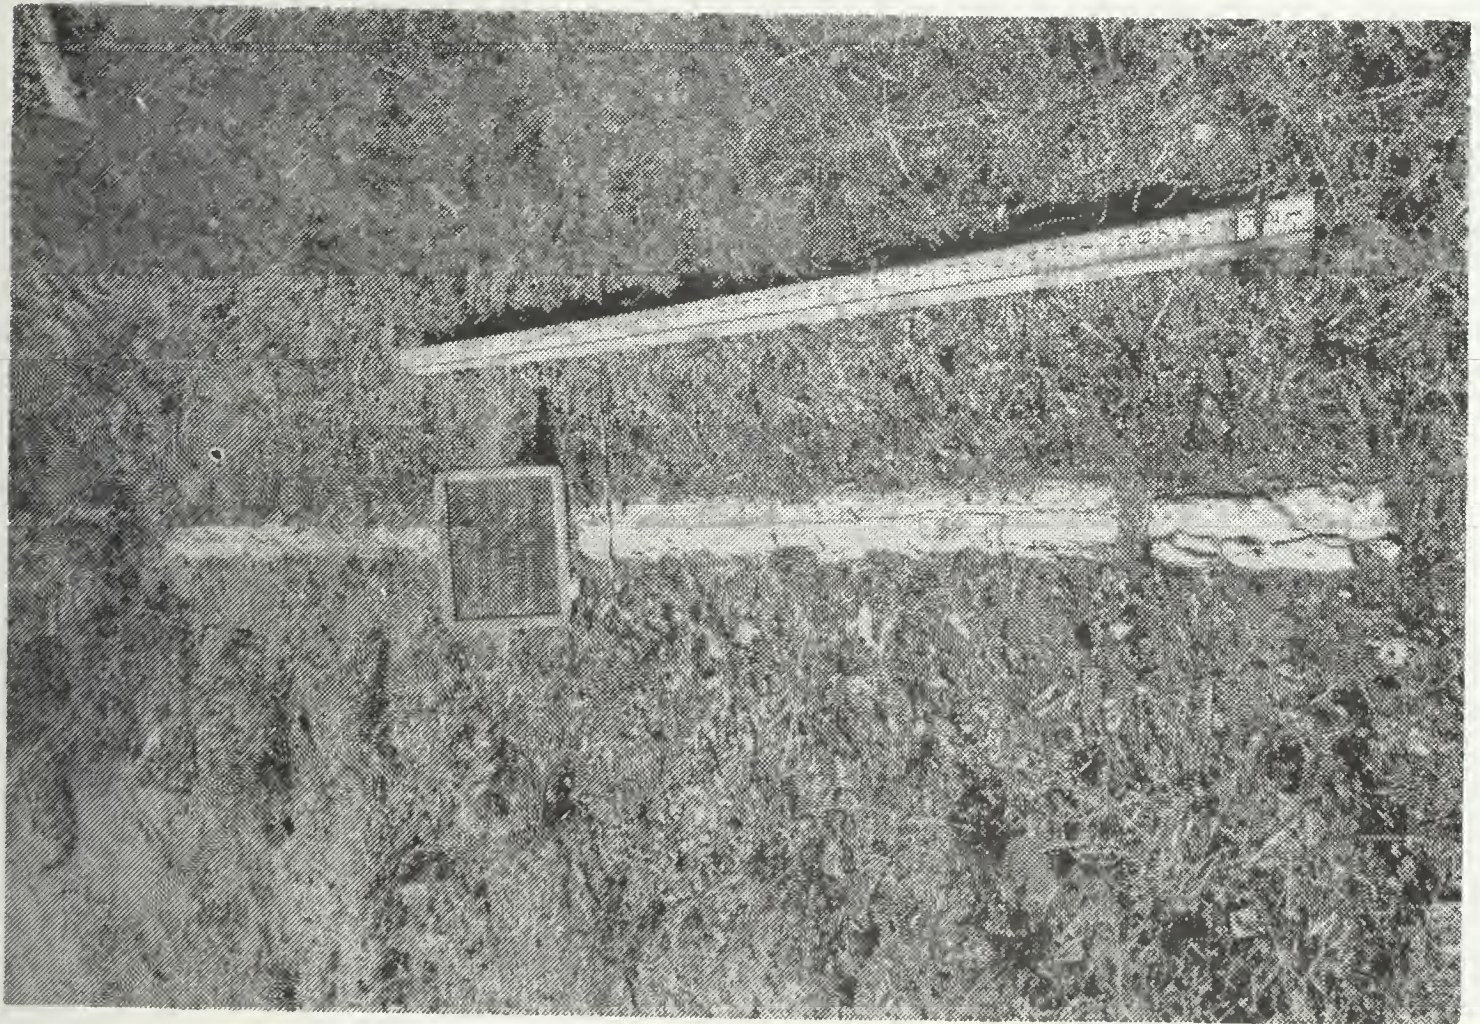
A. Mullikin Street Curb at the Douglas School Site, 1980.
